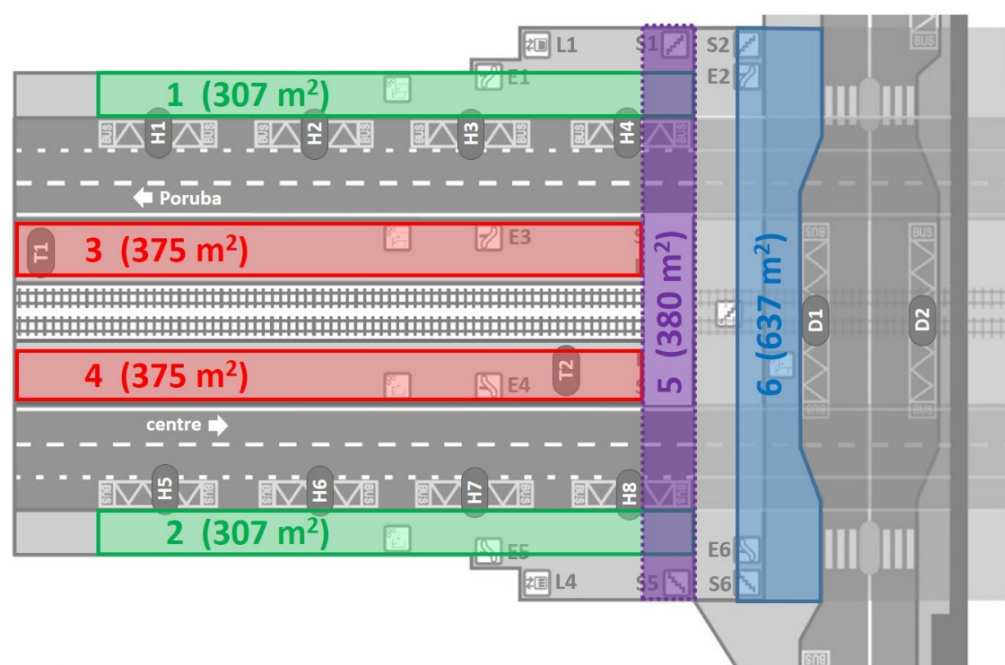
Determination of the size of pedestrian areas (1 + 2—bus platforms on the 2nd floor, 3 + 4—tram platforms on the 2nd floor, 5—connecting corridor on the 1st floor, 6—space for pedestrians on the ground floor). Modified from [75,79].
